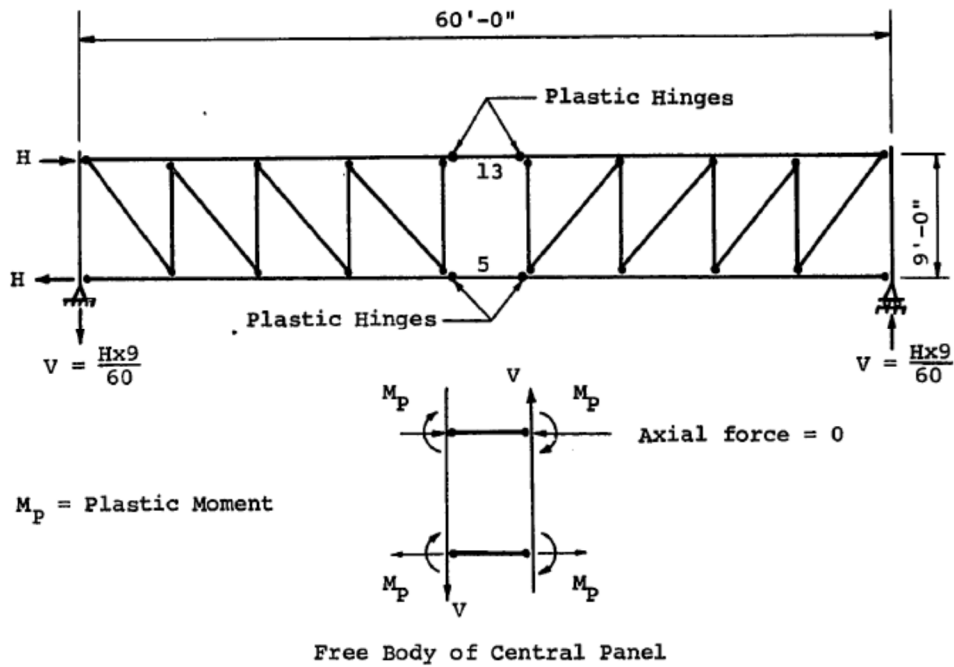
Failure mechanism of the truss (Gupta,1971).
